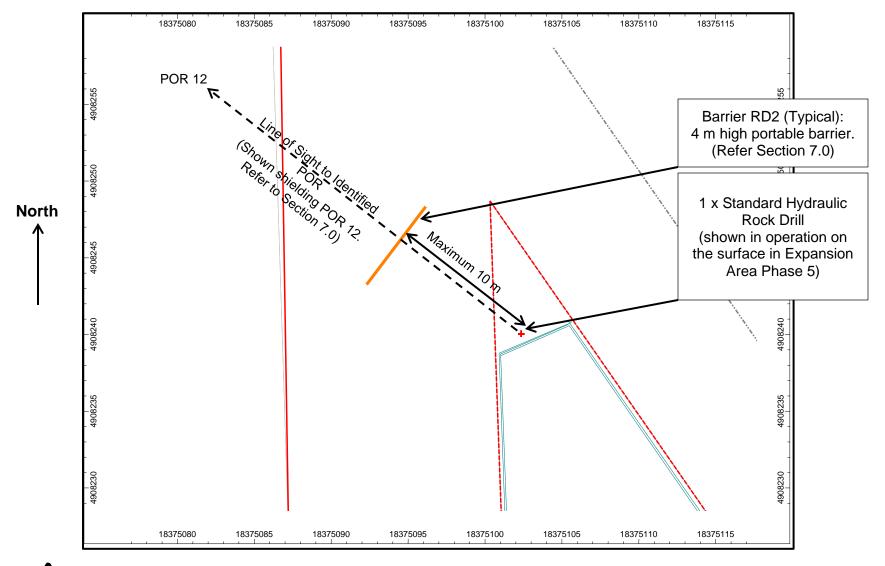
Noise Barrier Detail – RMC_Existing_1 and RMC_Existing_2
